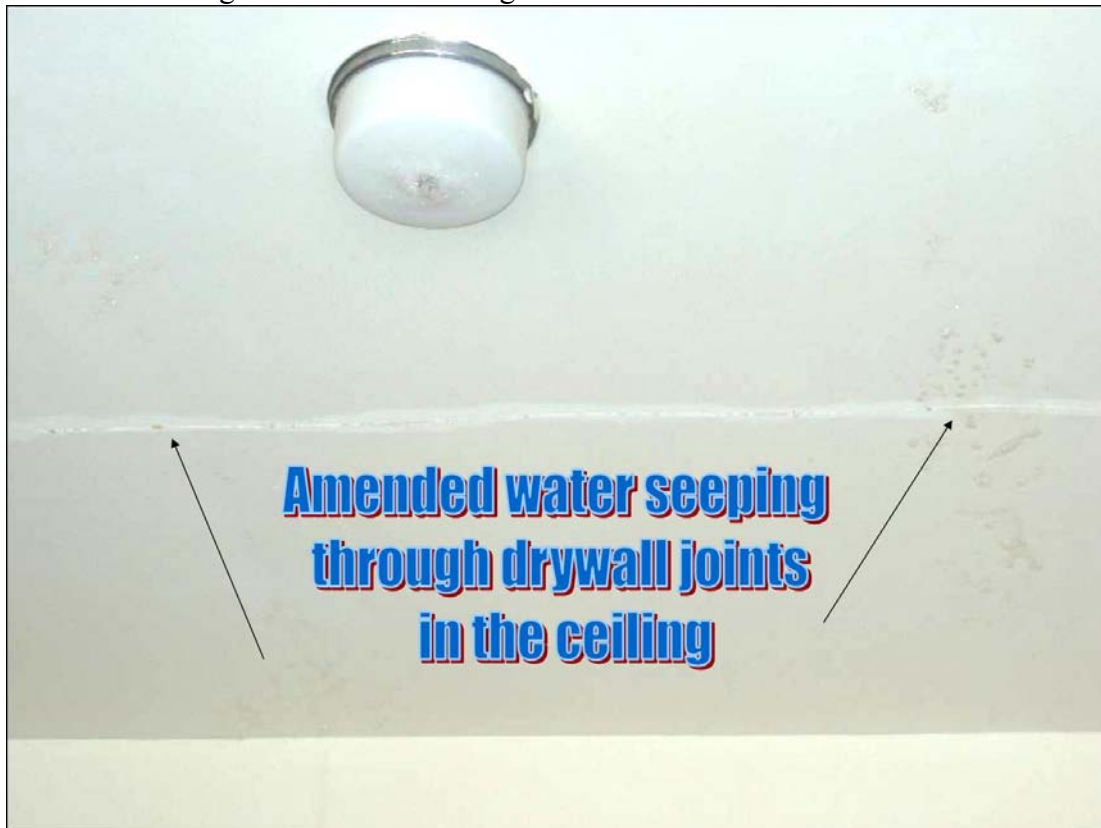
Amended Water seeping through ceiling drywall joints.
